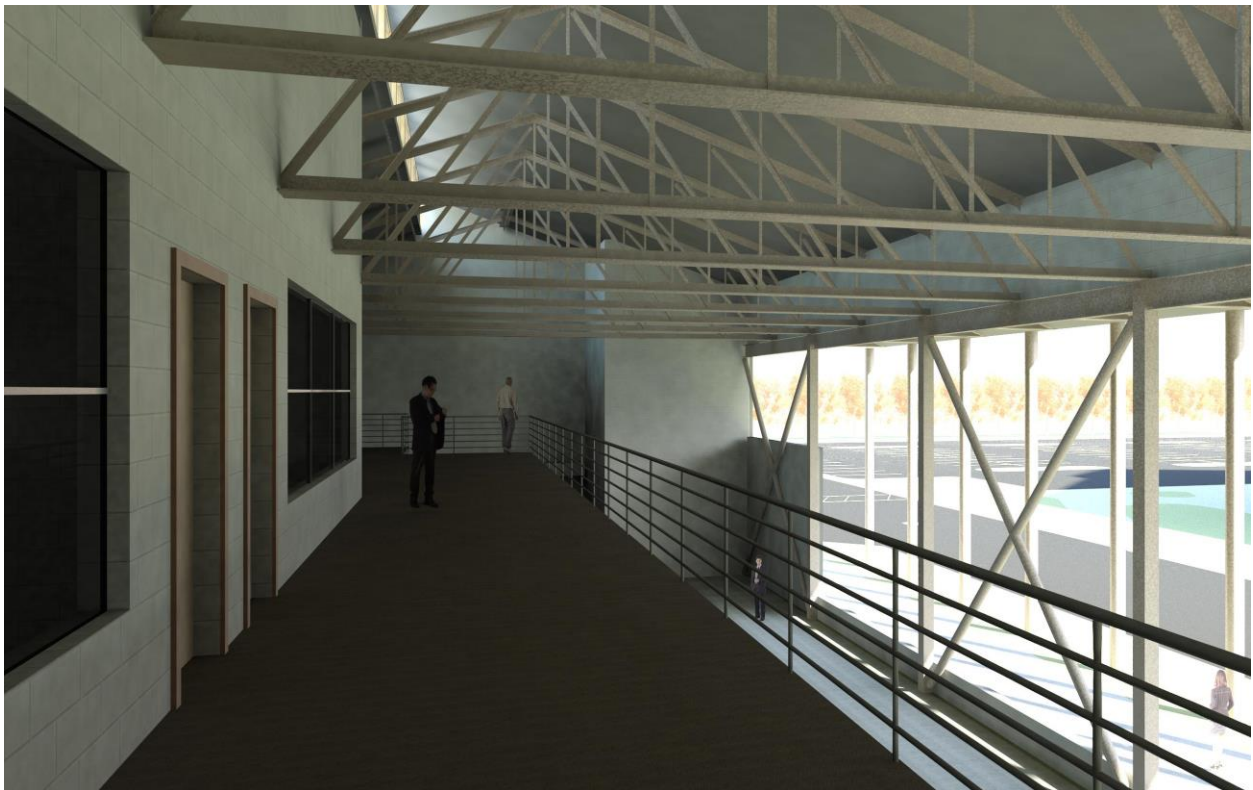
Expanded Project Space from the Mezzanine Hallway
